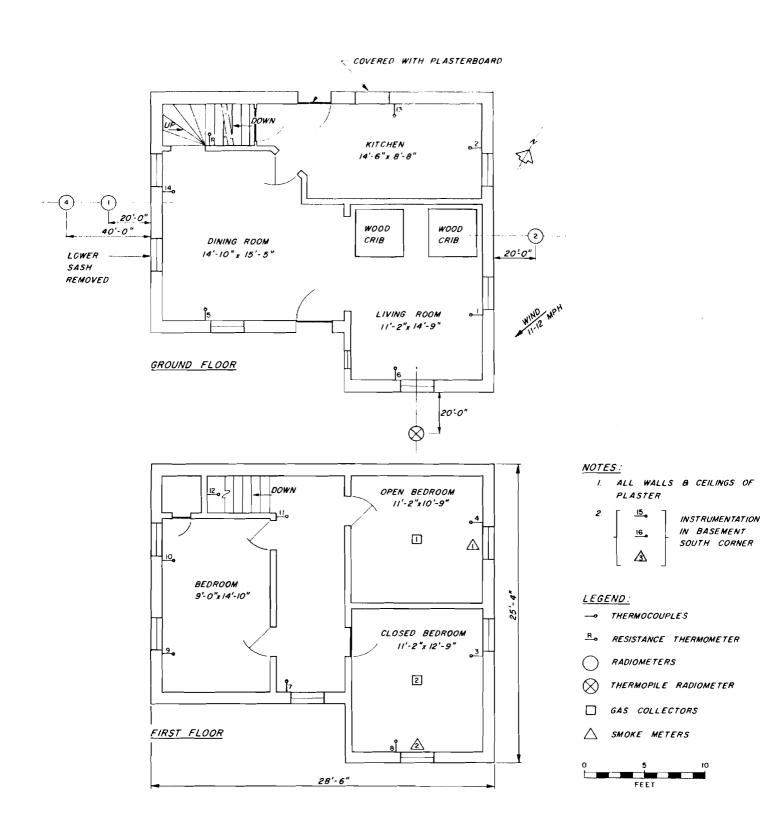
BUILDING No. 4 - TWO - STOREY WOOD FRAME DWELLING WITH
